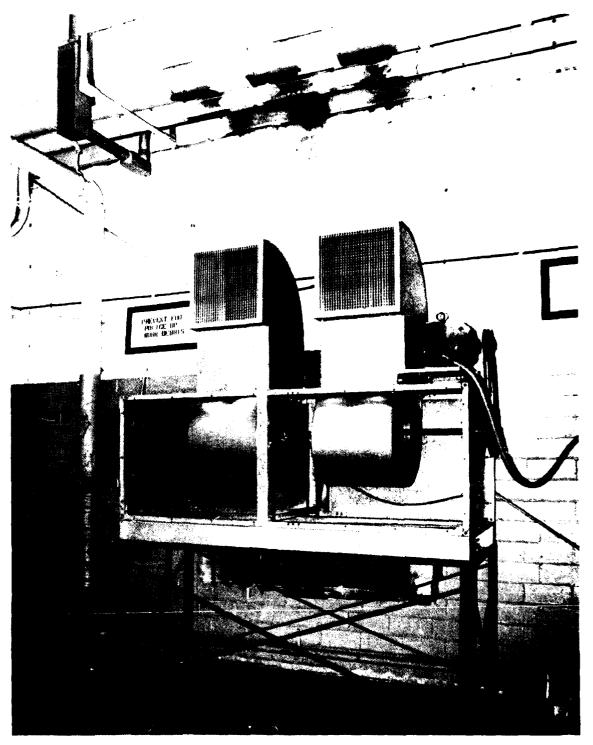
Typical Floor-Mounted Space Heater, Building 752, Langley AFB
